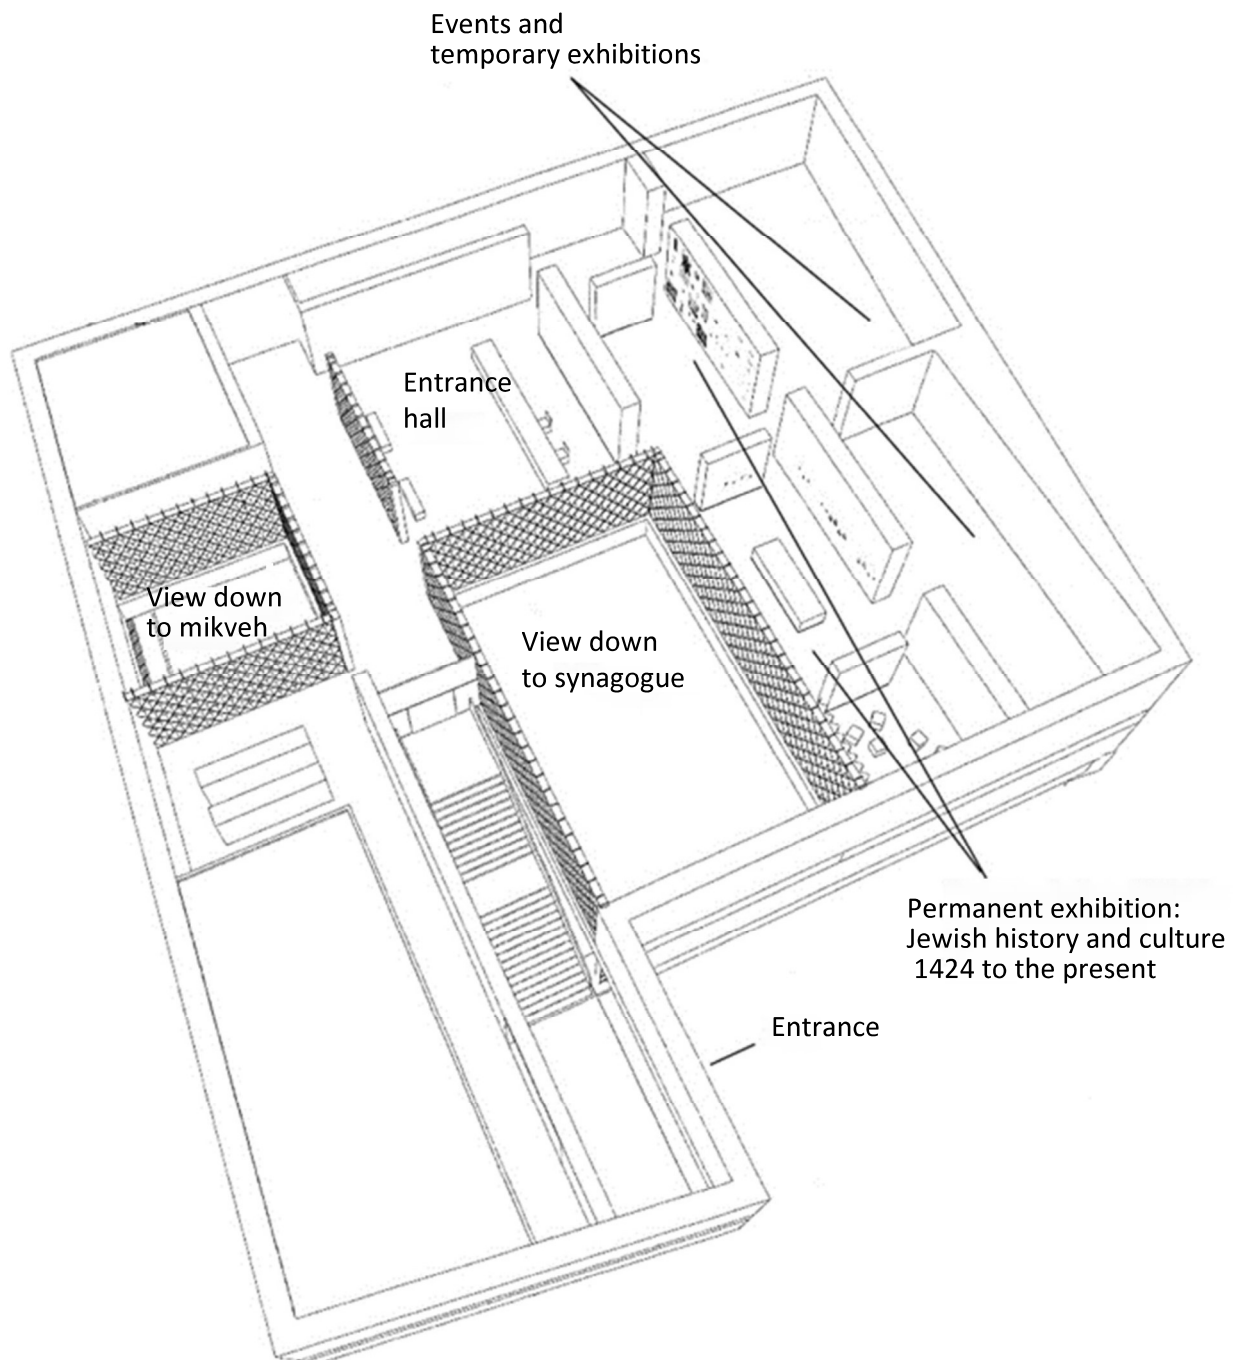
Plan of the upper floor of the new museum. From here, there will be views down to the underground excavations of the synagogue and mikveh.
